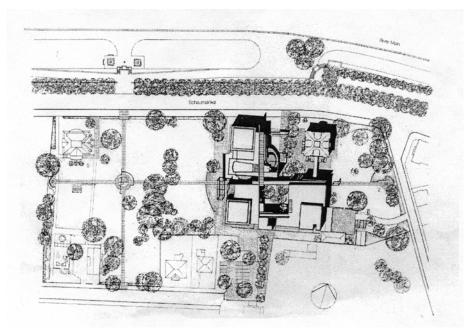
Site Plan of Kunstandwerk by Richard Meier
